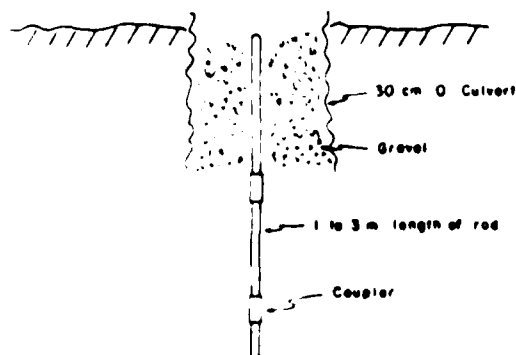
Ground rod (type 9). This is similar to the NGS class B, deep-driven rods, which are very stable in salt marshes (author's note).
